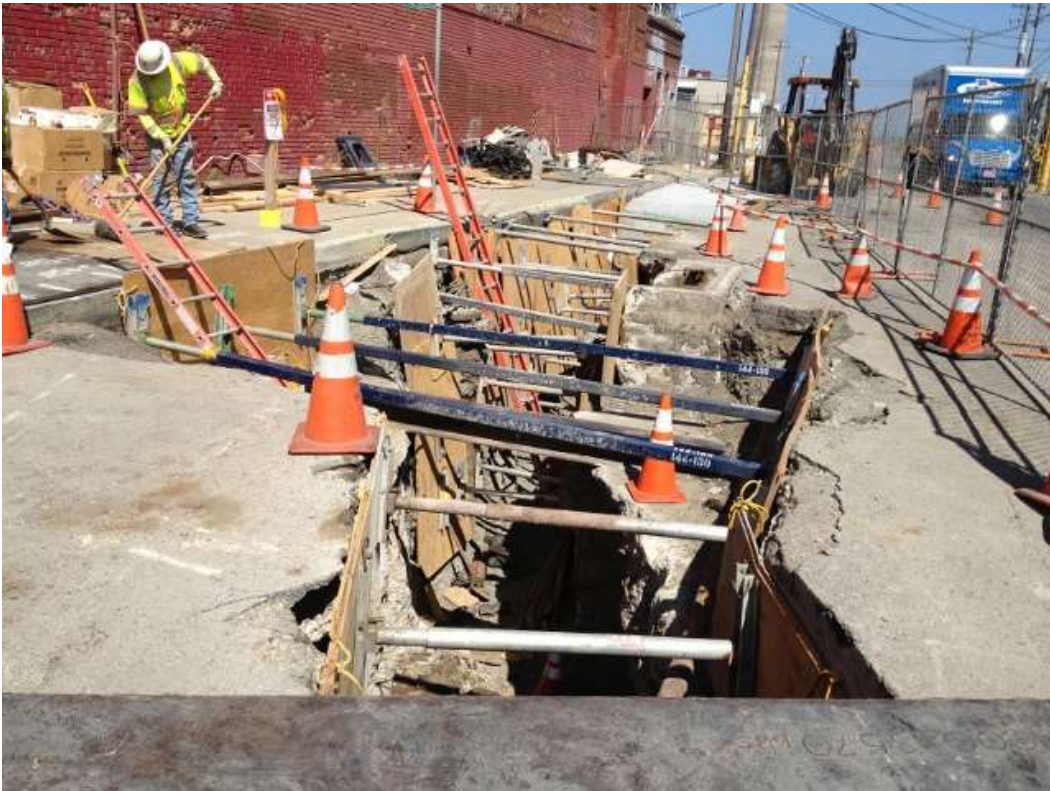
Building wall in duct bank trench for Station A water circulation vault feature on 23rd Street. View south, August 25, 2015.
